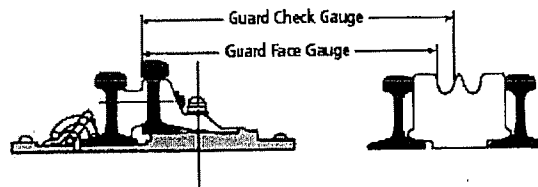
Guard Check Gauge and Guard Face Gauge Measurement Locations.
